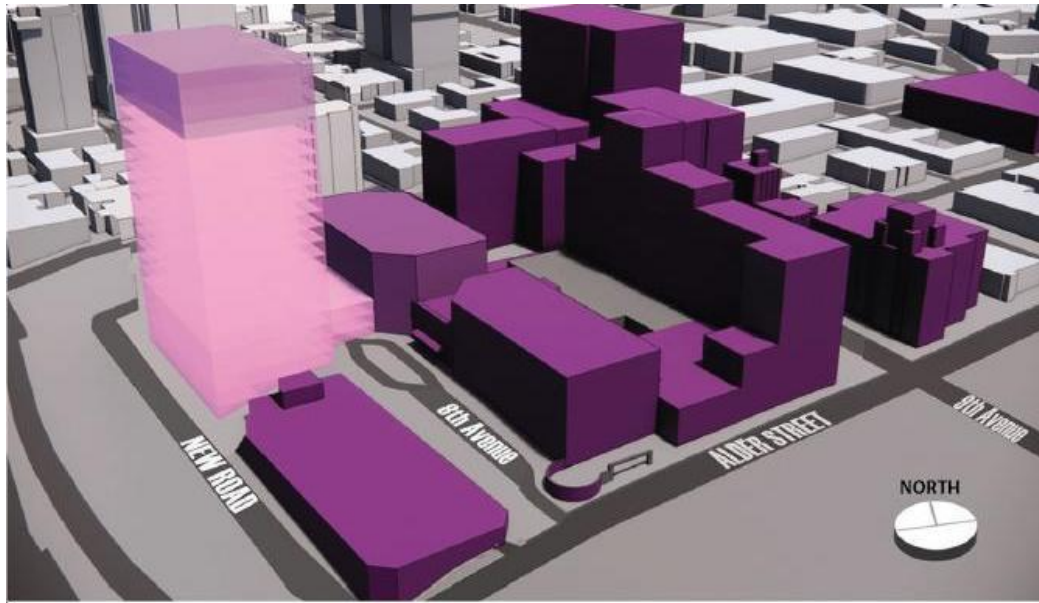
3D IMAGE OF EXISTING AND PLANNED NEW PATIENT TOWER
